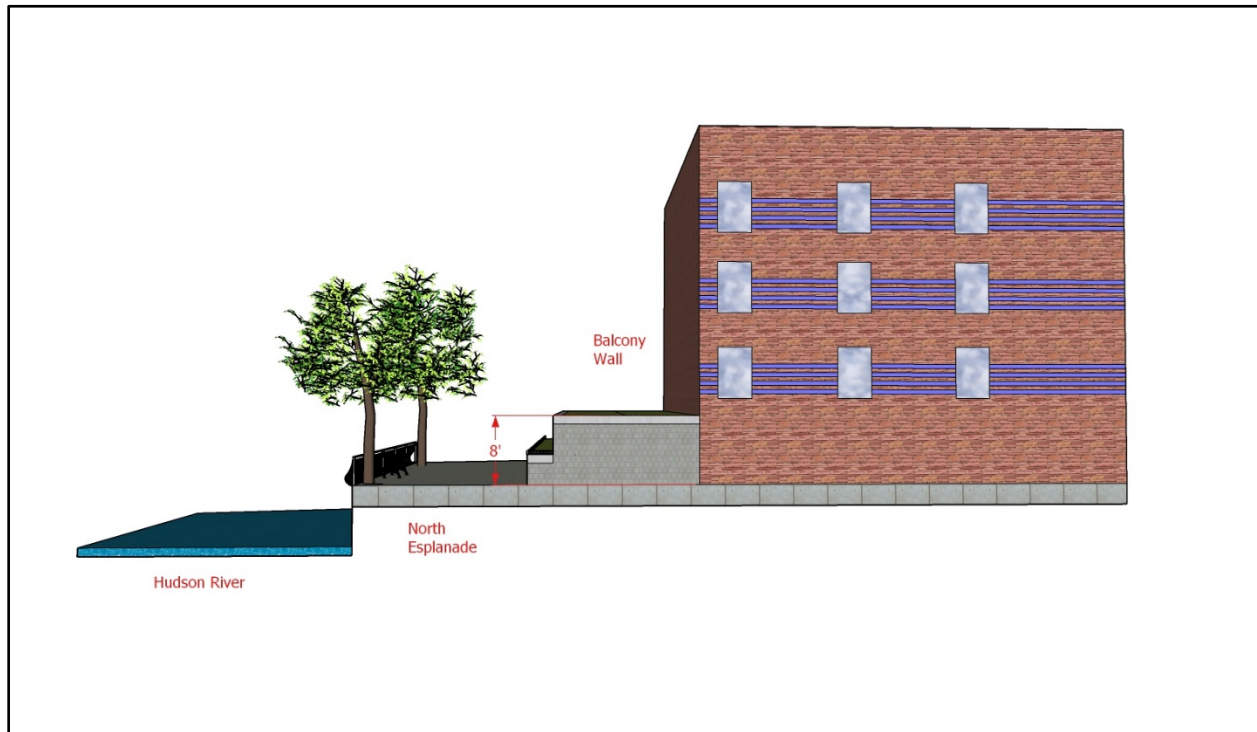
Cross Section View of Permanent Wall in Segment 2
